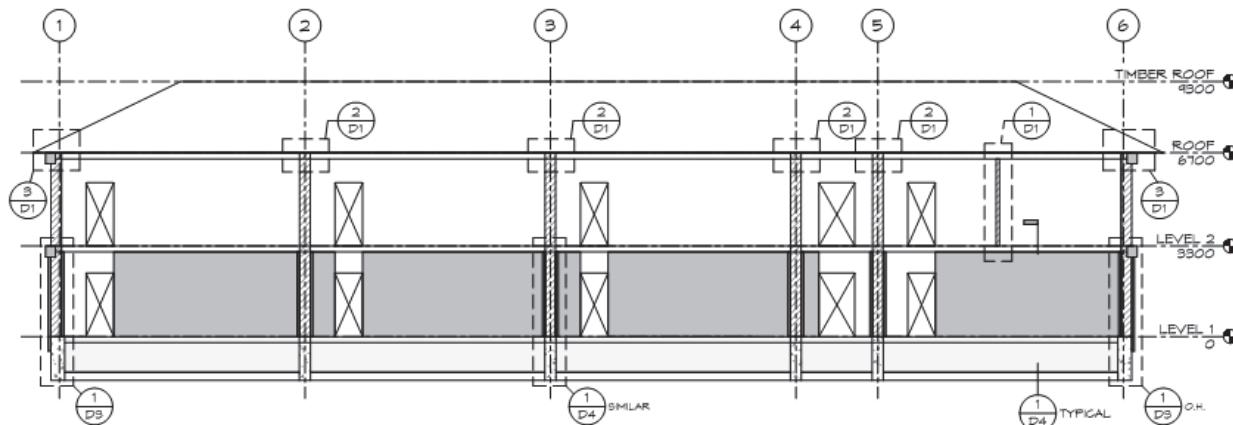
Reinforced concrete jackets added in CM Increment 2.
